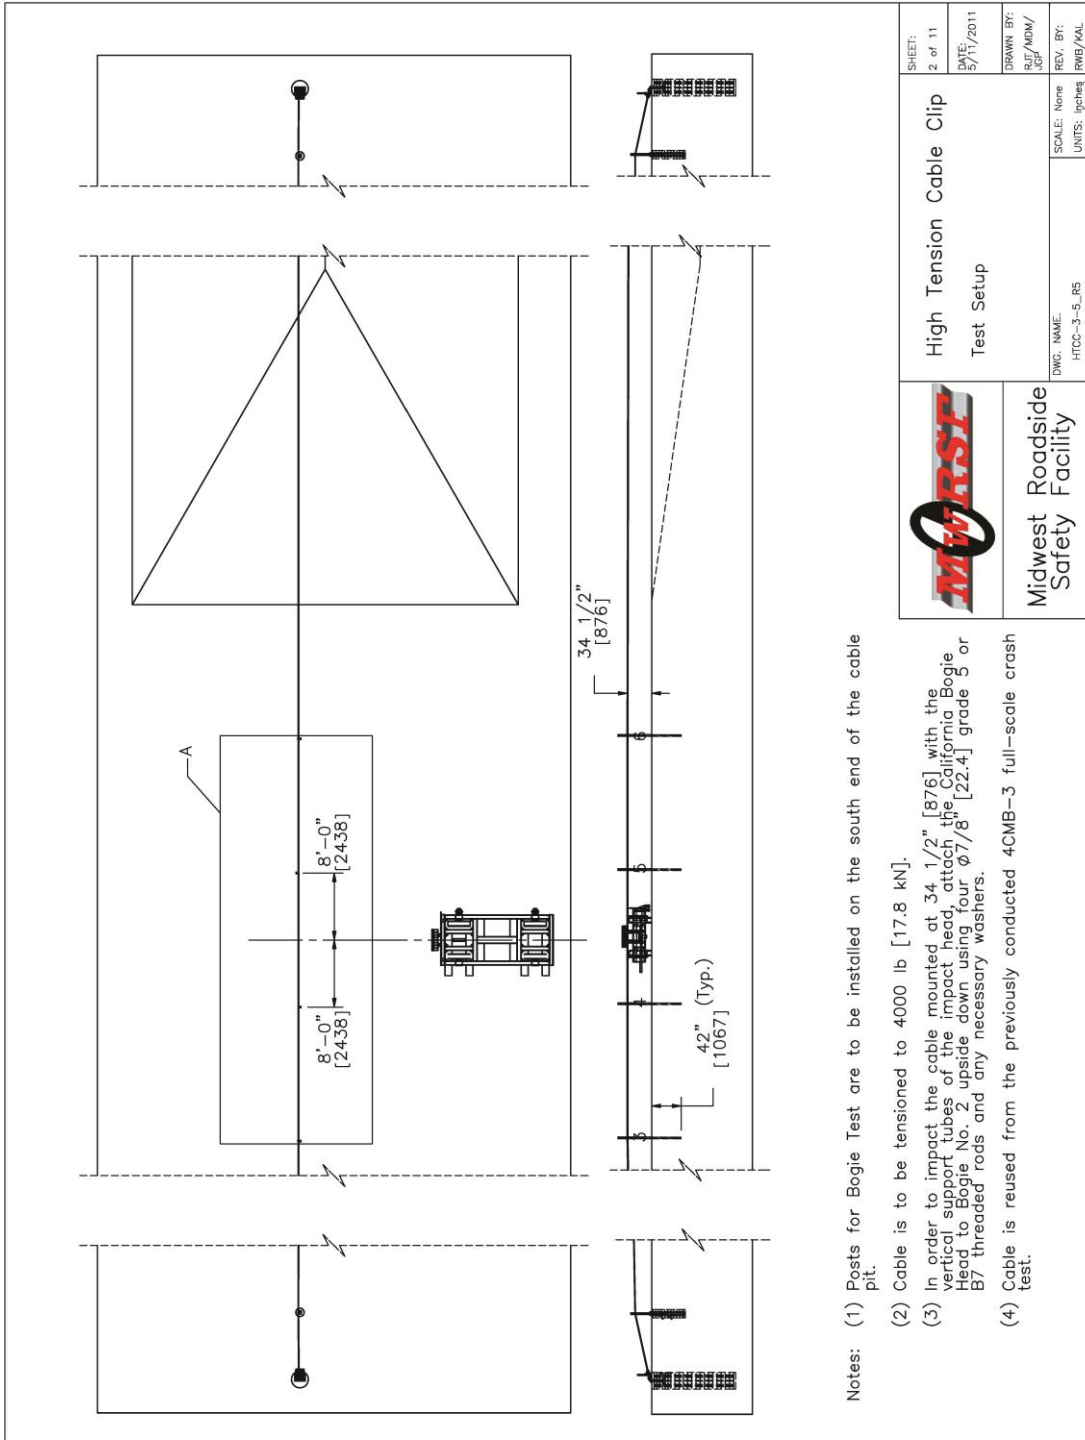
Testing Details, Test Nos. HTCC-4 and HTCC-5
